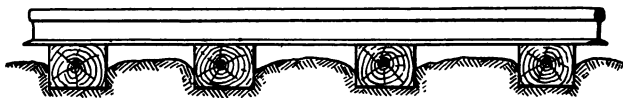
Longitudinal Section of Track on New Grade After Being Used by Construction Trains.
